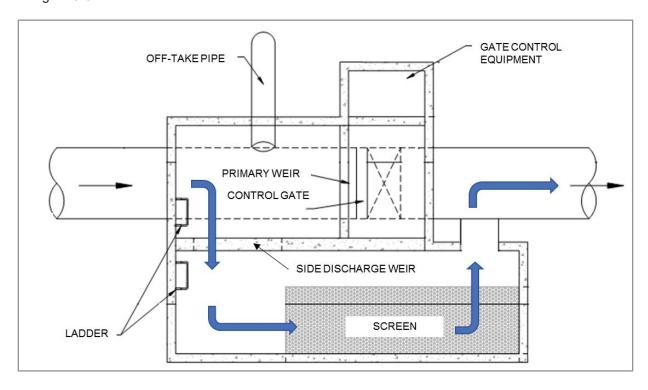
Proposed Typical Off-Line Screening Arrangement
